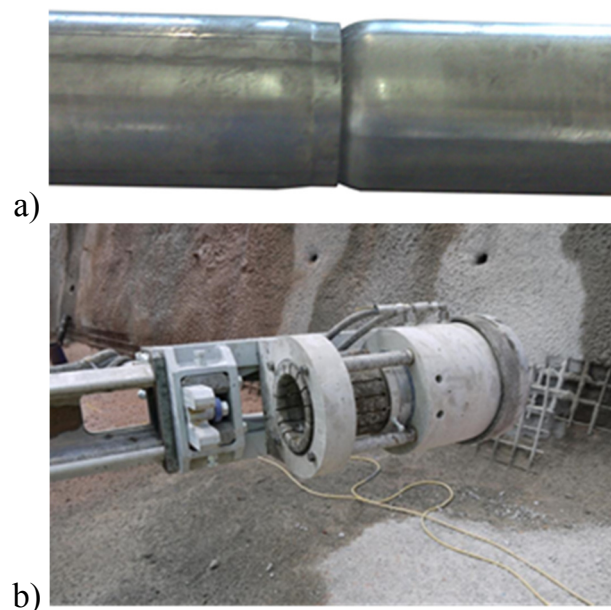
a) squeezed connection and b) squeezing console mounted on a drill boom.
